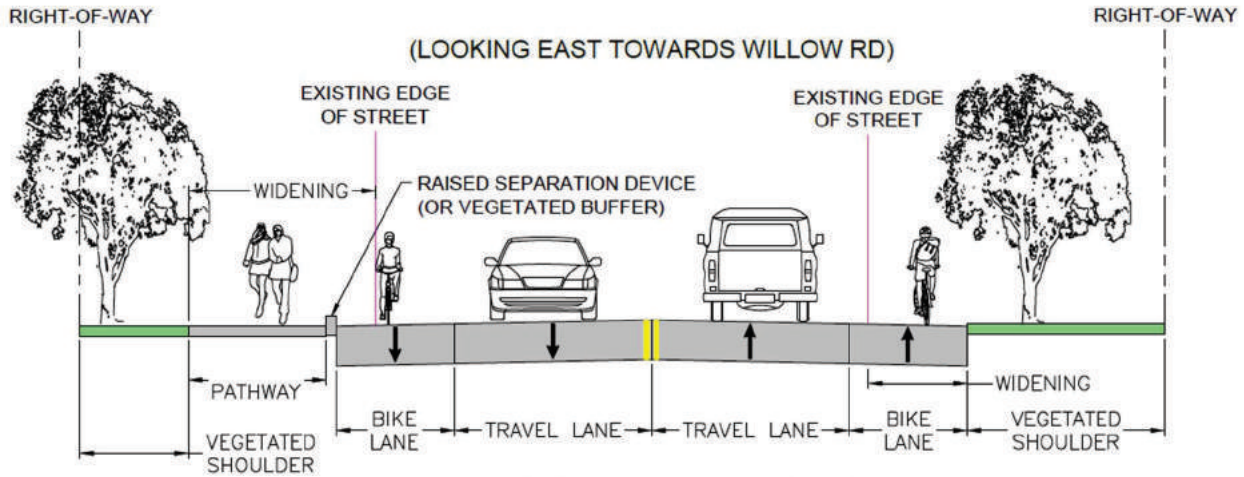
Coleman Avenue (Menlo Oaks) Preferred Long-term Alternative Cross Section
